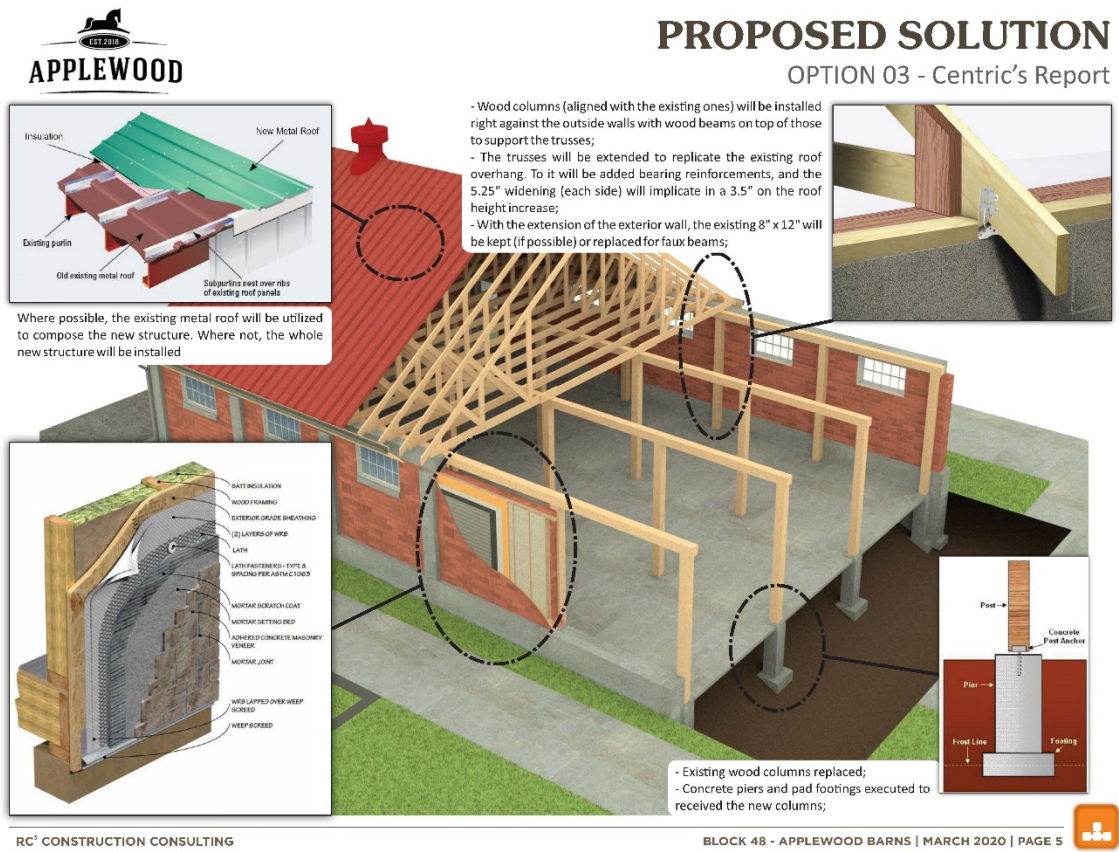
Cut-away detail showing the proposed solution to address code compliance issues for the barns, including new exterior wall for the building envelope, new roofing detail, and post and beam structural reinforcement on the interior.
